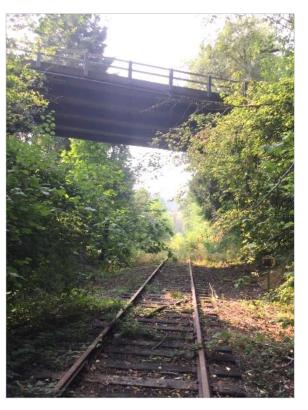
Rail corridor beneath Holcomb Road, looking south.
